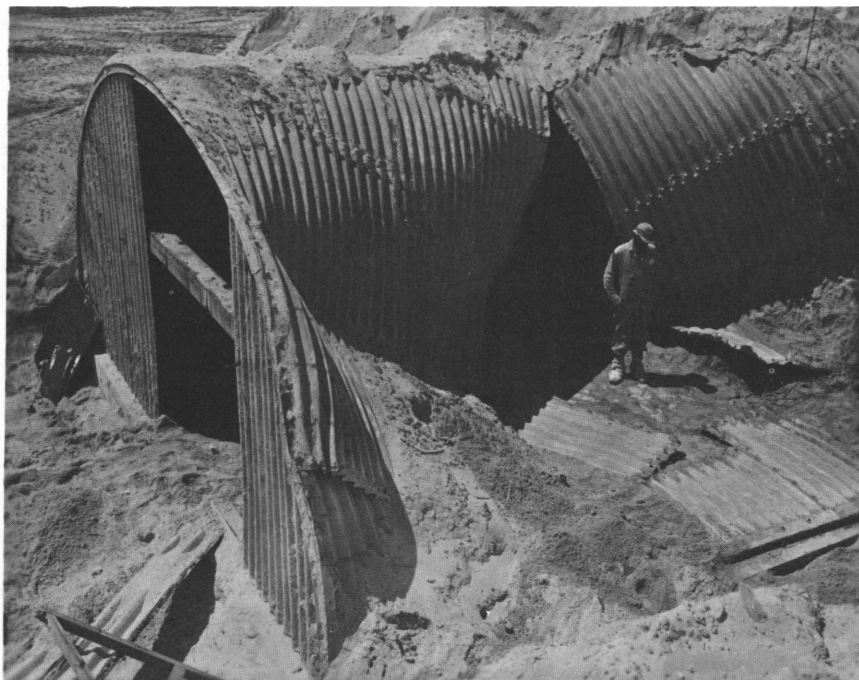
Structure 3.2a, postshot, showing deformed section of structure on side away from GZ after excavation for examination. End-wall sections had been removed so that sand could be removed from within the structure more easily.
